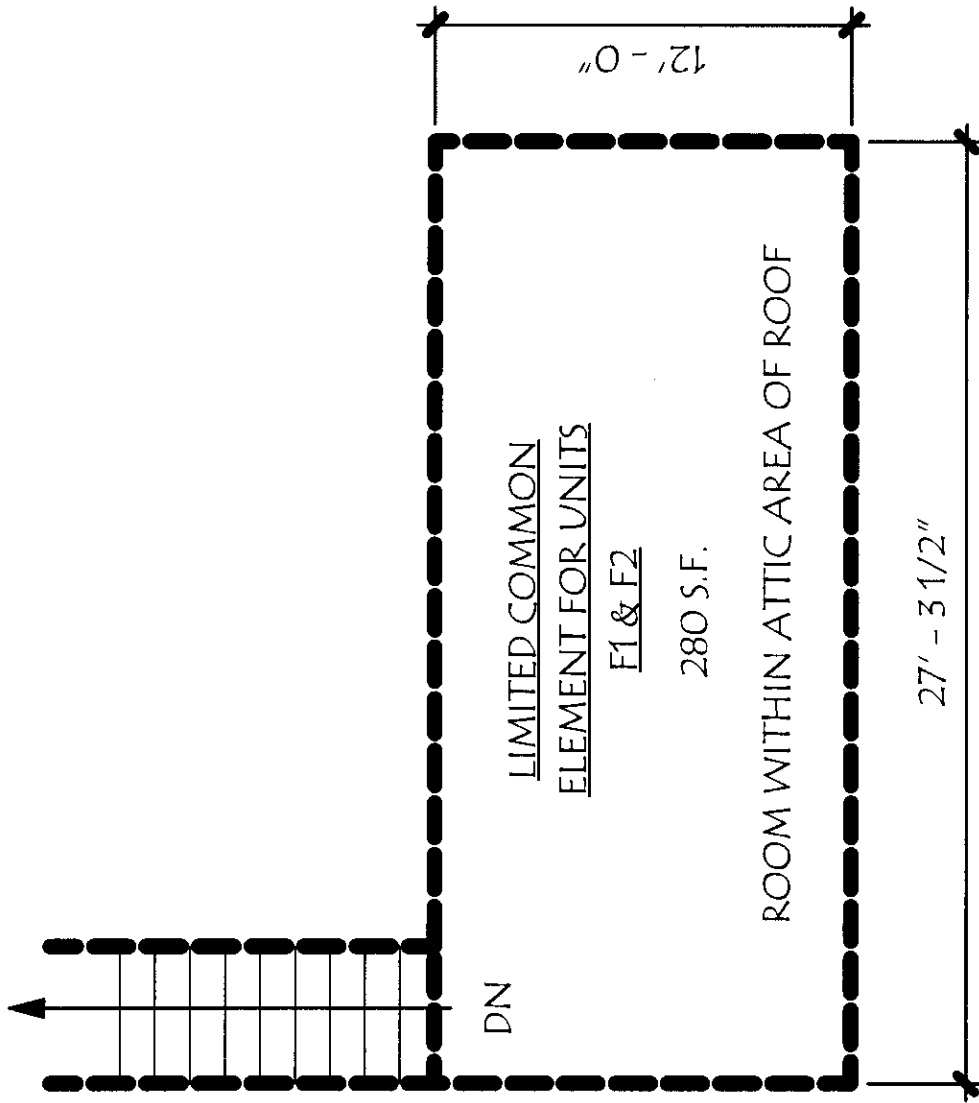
EXHIBIT "E" - CERTIFICATE OF FLOOR AND SITE PLANS
